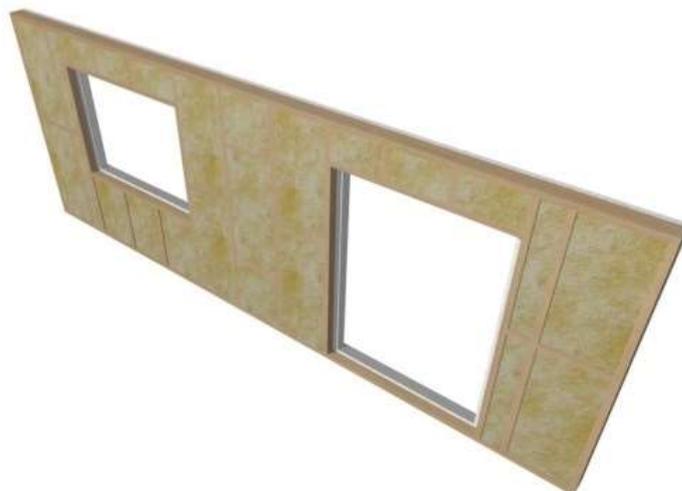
Structural core of a wall panel made of timber elements, fire-resistant boards from both sides filled with mineral wool.
